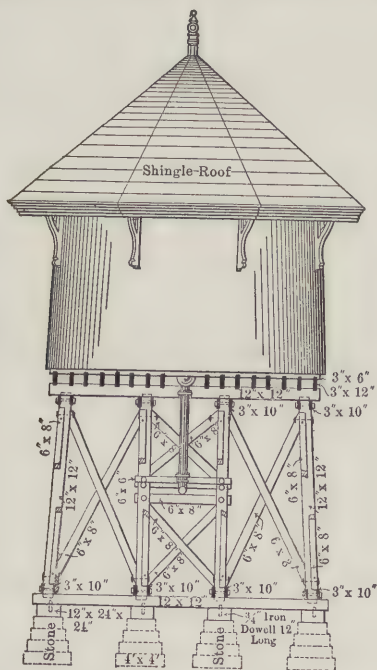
ELEVATION OF TANK AND SUPPORTING FRAME WORK LOOKING FROM POSITION C OF LINE C-D, FIG. 86
